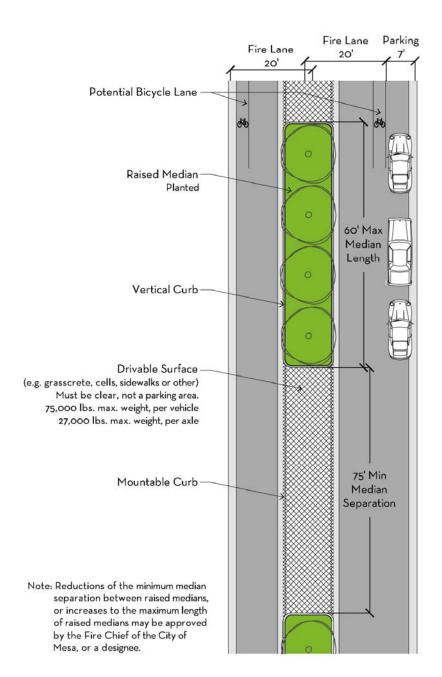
On-Street Parking and Bicycle Lane Options - Details
